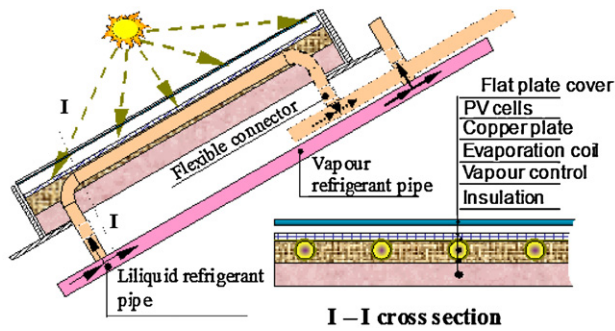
Cross-section view of the PV evaporator roof panel [14].
